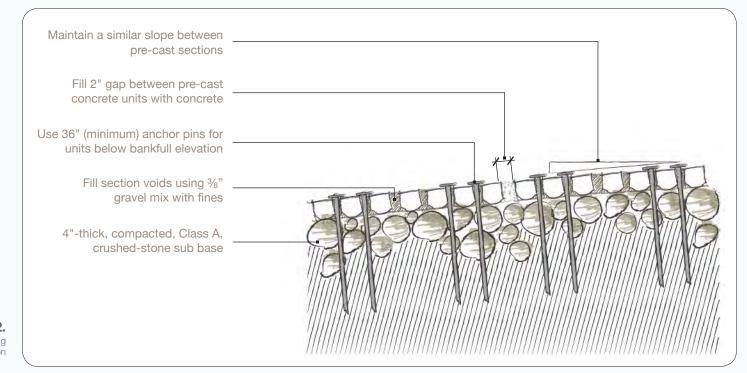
A-12. Pre-cast Concrete Anchoring Below Bankfull Stream Elevation
